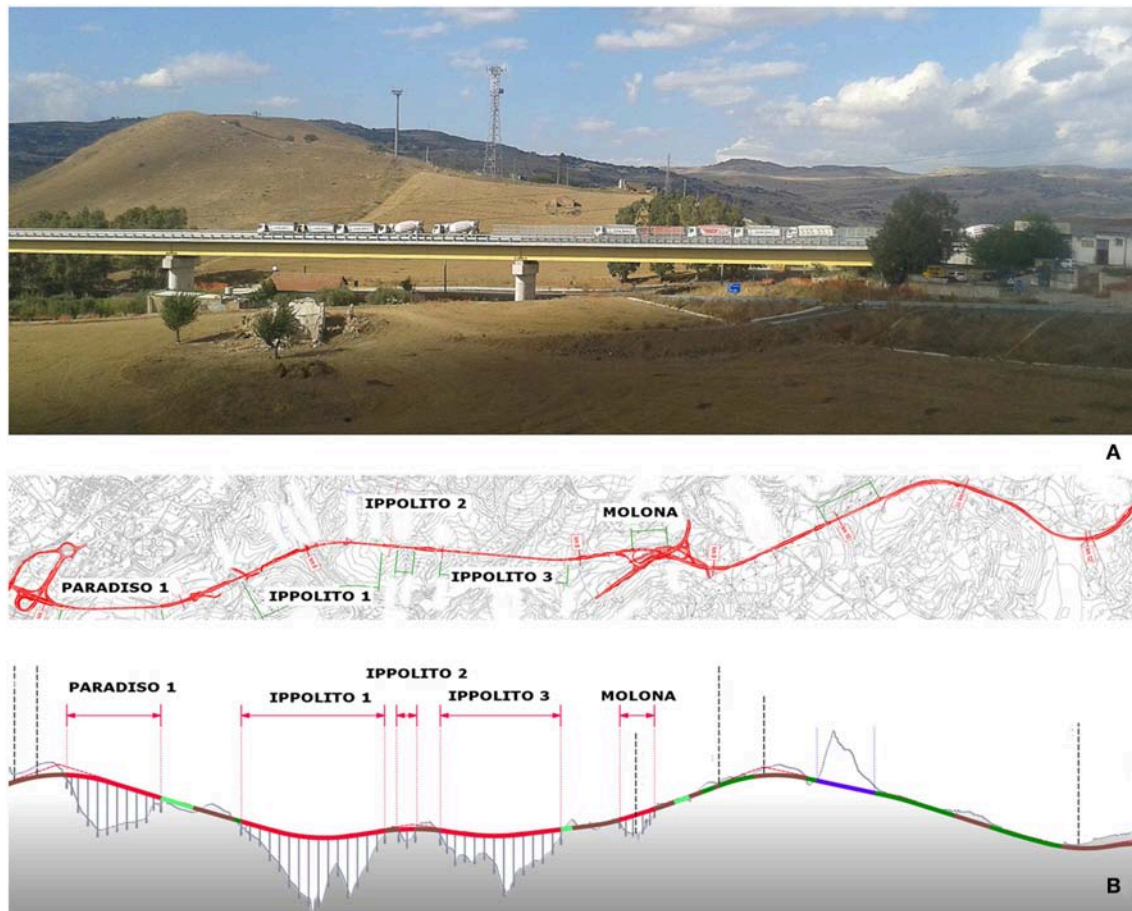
| (A) The Ippolito1 Viaduct during the load test; (B) “Caltagirone Variant”: plant and longitudinal section of the fast-flowing road.
